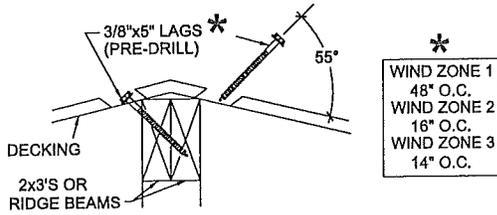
FASTENING AT ROOF MATING LINE
